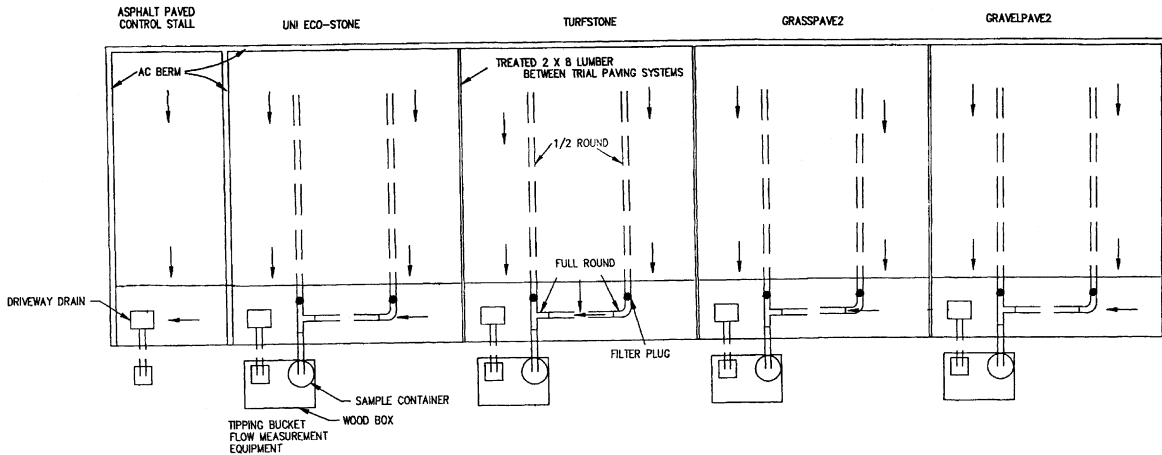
Plan view of the nine test parking stalls. Each permeable pavement type had two parking stalls paired into one instrument station.
